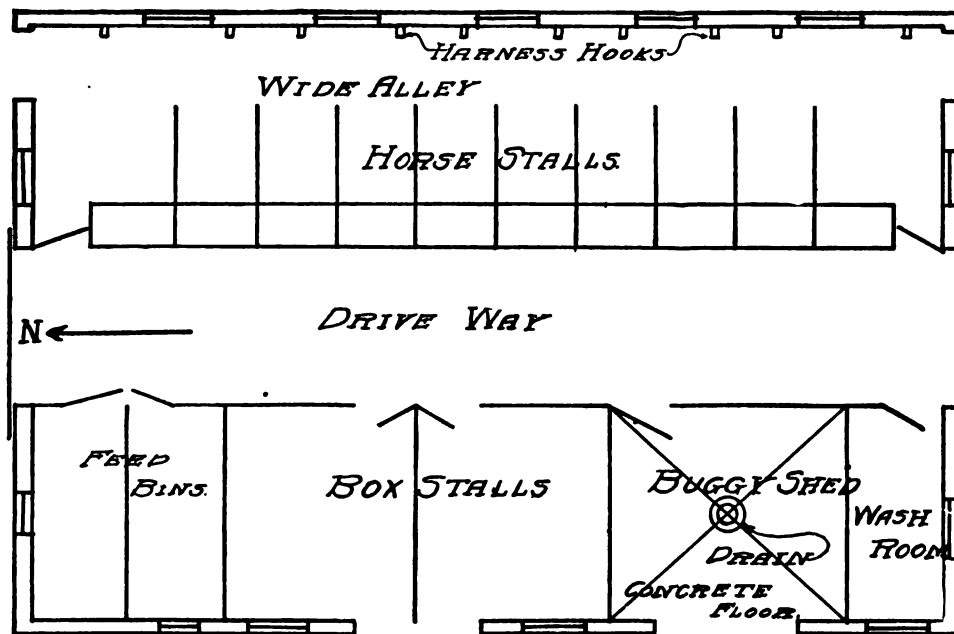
Plan of a general work horse barn. A harness storage and repair room would be an additional advantage, but for daily use harness is best kept behind the stalls.
